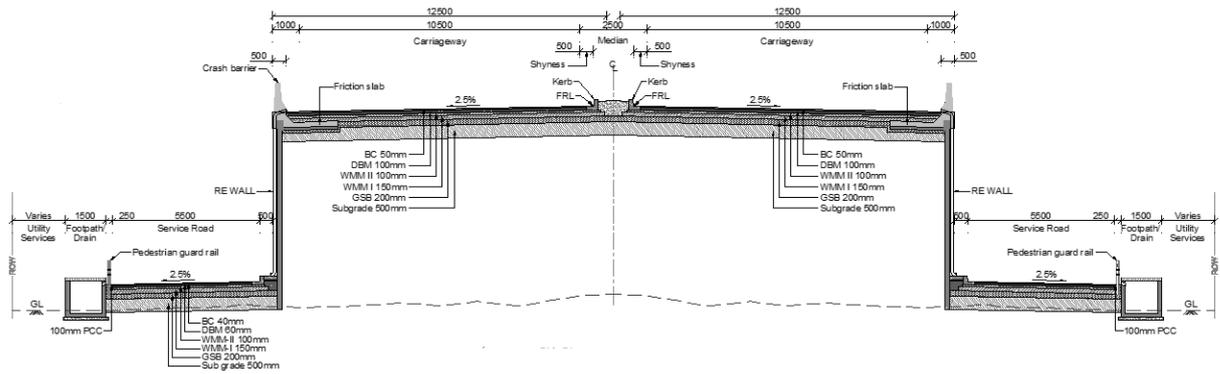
TCS 10.3- Approach Of Elevated Structures
